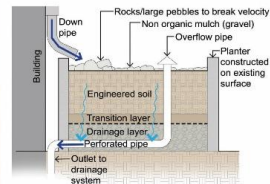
Cross section through bioretention planter from disconnected downpipe
